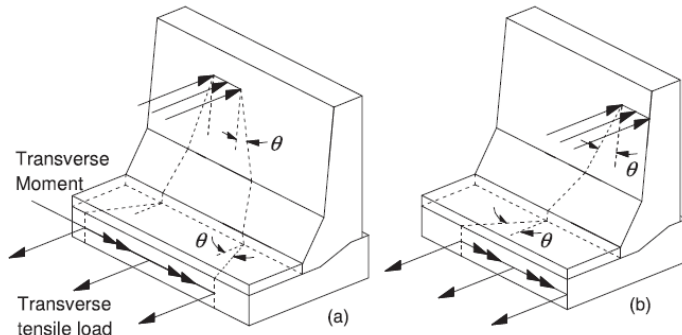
Transverse load dispersion at interior and exterior portions of the barrier wall
